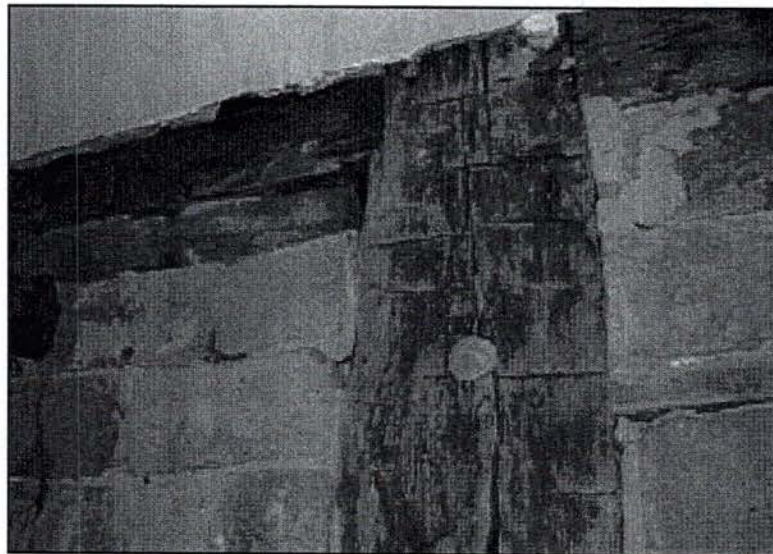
Detail of a hand hewn timber framing member, possibly recycled, found in Room 206.
